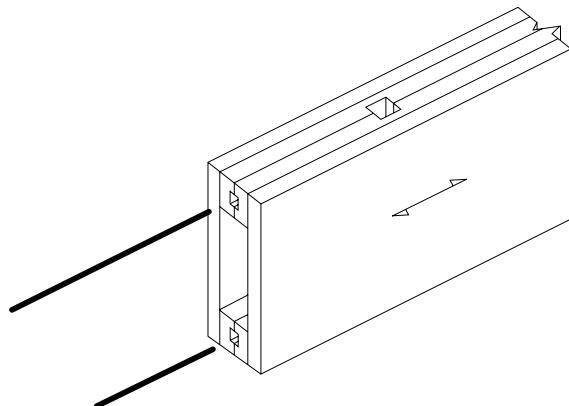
Quick-Connect Moment Connection Utilised in a Box Beam
